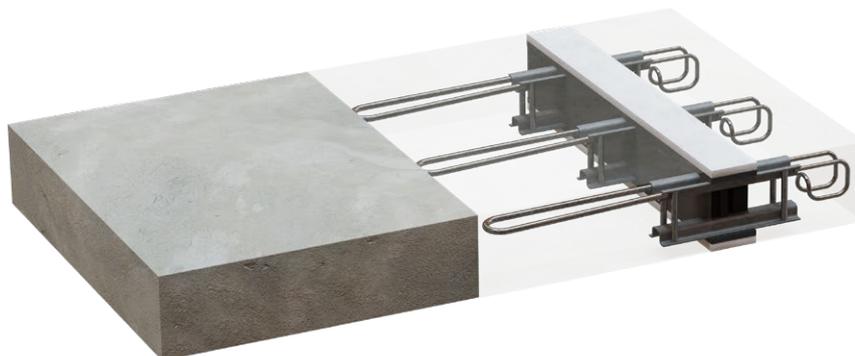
The TIPOMEGA® connector anchored in the beam using UD4-shaped bars, welded to the upper profile and bent downwards
